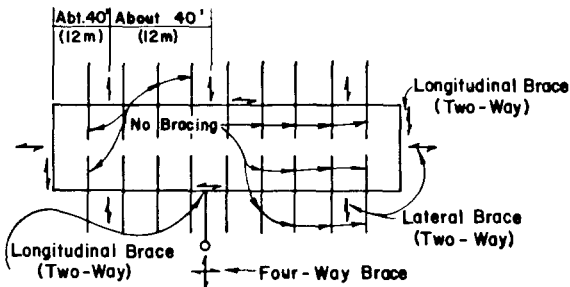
(d) Typical Location of Bracing on a Looped System.
